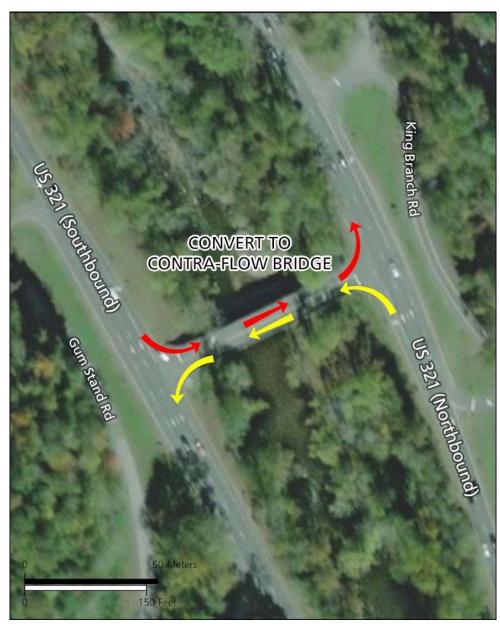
ALTERNATIVE 2—SUBAREA 1 PROPOSED CONTRA-FLOW BRIDGE
